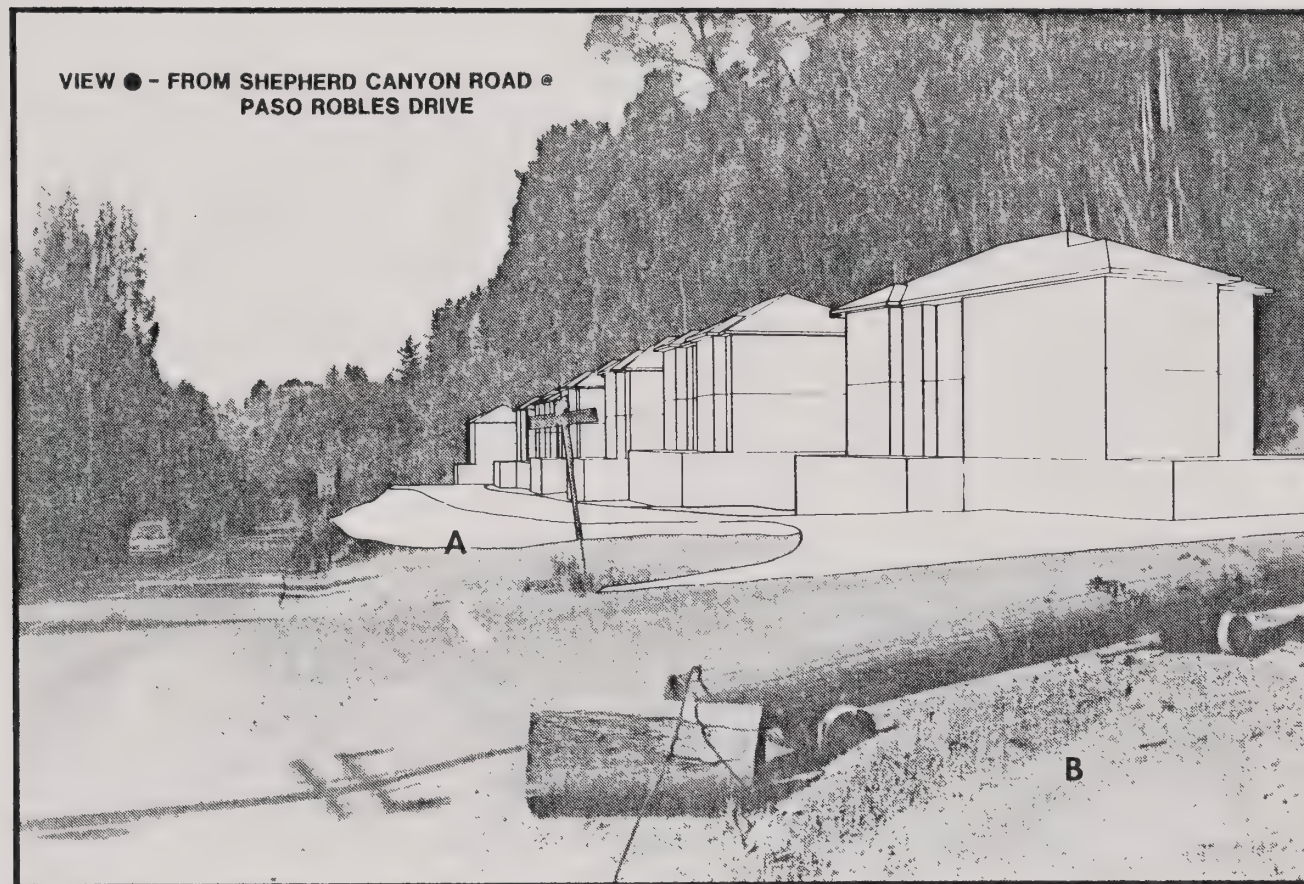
B. After-development view of project site with same vantage point as Figure 31-A, above. A: Area along Shepherd Canyon Road frontage and at southeast corner of site, where applicant proposes landscape screening. B: Landscaping along the west end of the Shepherd Canyon Heights site will also be important, to provide screening from westbound Shepherd Canyon Road east of the project site. (Figures in the Environmental Impact Analysis section of the EIR show potential of such landscape screening.)
